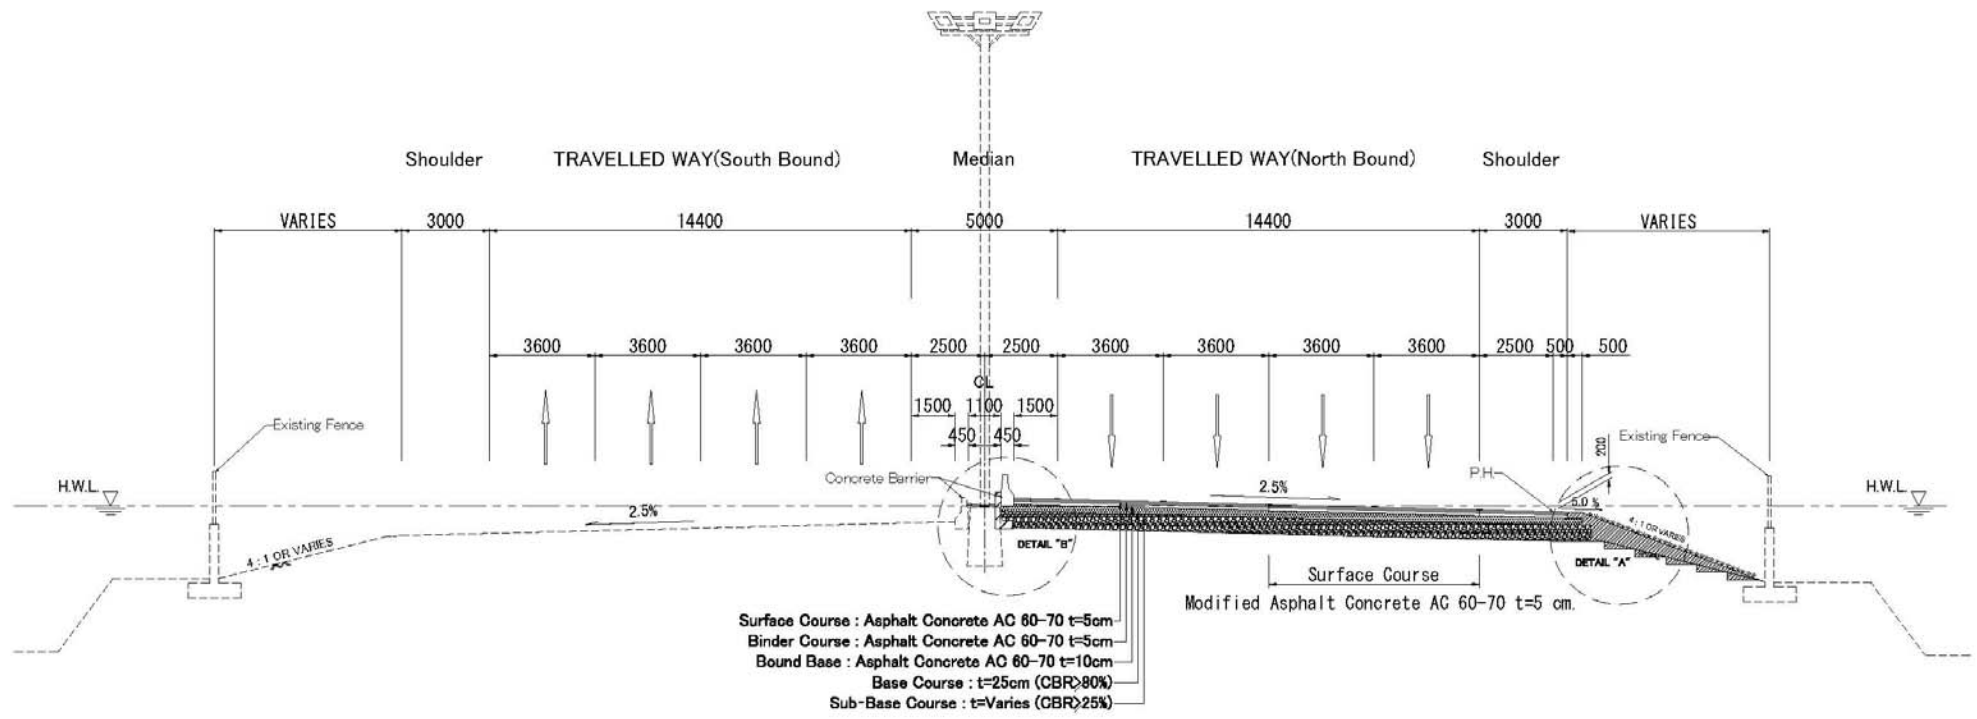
Typical Cross Section (Standard Section)
